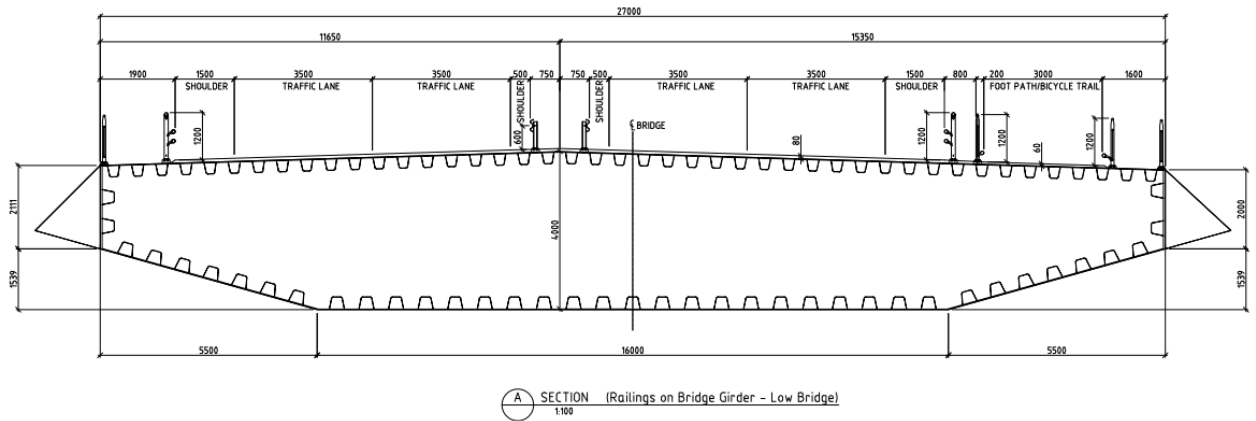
Typical section of Bridge Girder with traffic lines, other parts of the bridge deck and location of the Railings
